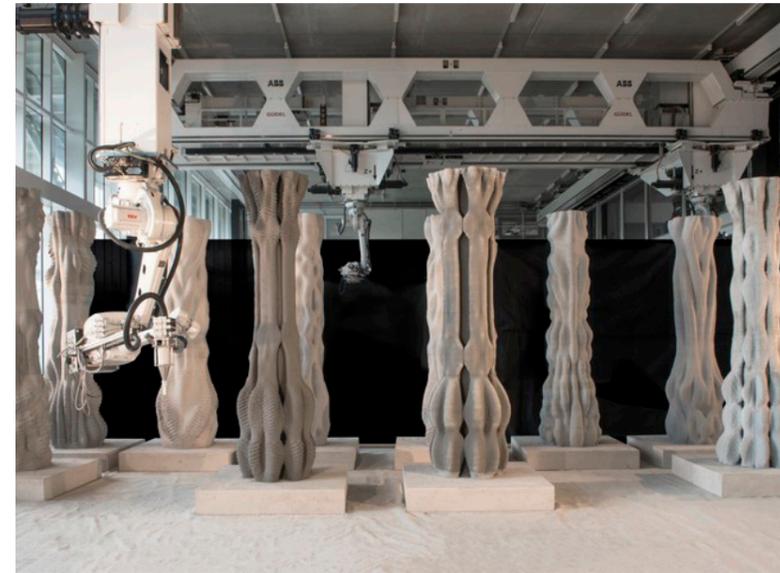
| 3D printed concrete column by ETH Zurich.
